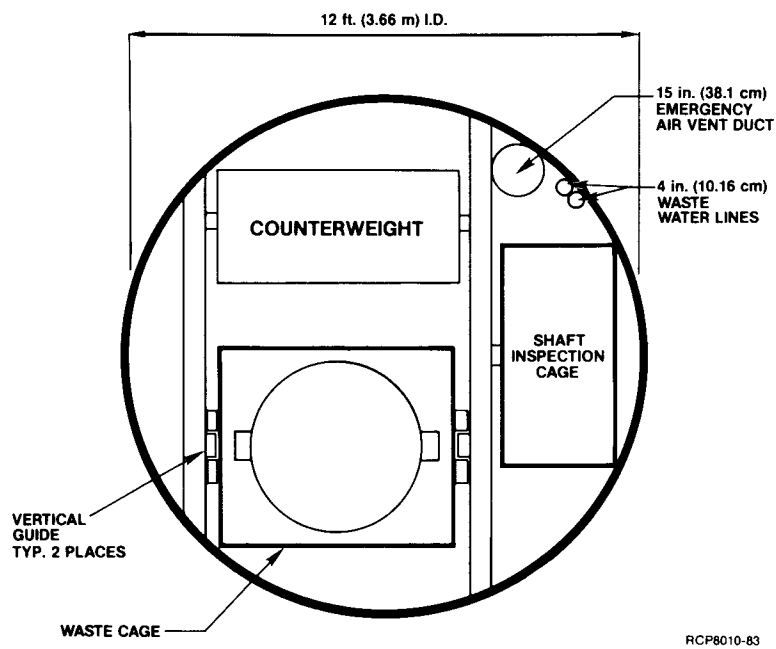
Shaft No. 2 Waste Transport Shaft.
